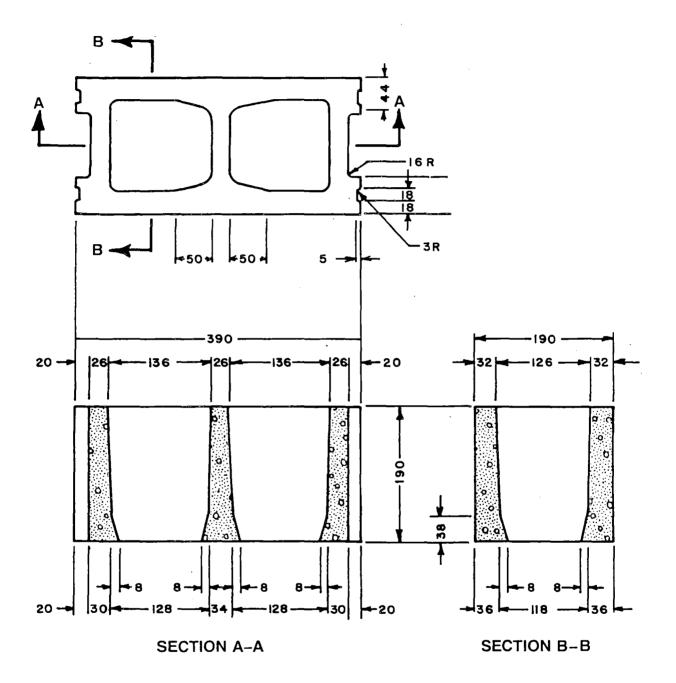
Dimensions of 200 Standard Concrete Block Units
